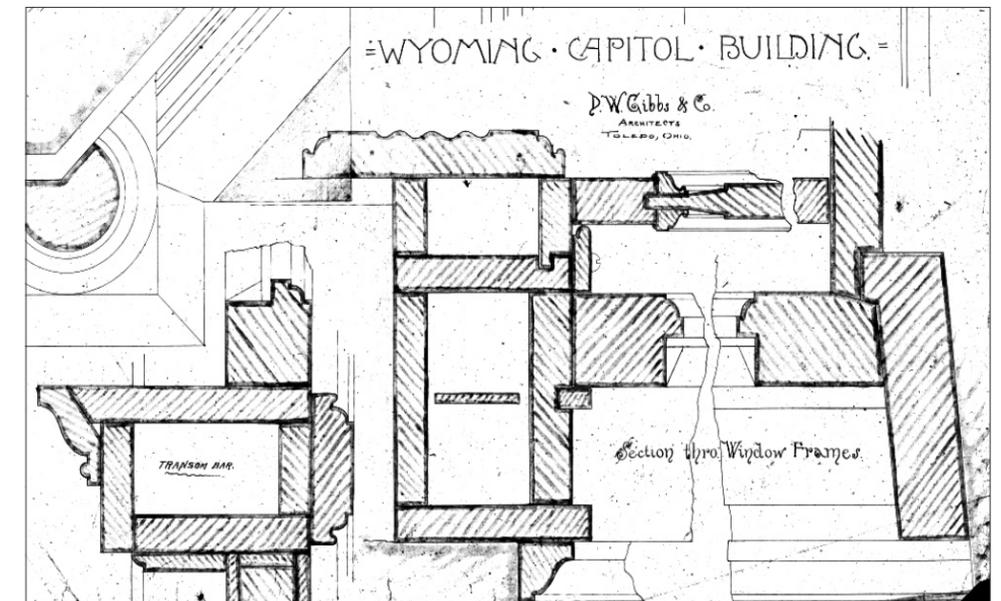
Architectural Detail Drawing, ca. 1888. The drawing shows sash weight pocket and interior shutter. The drawing also shows the profiled molding at the exterior frame and interior trim.
